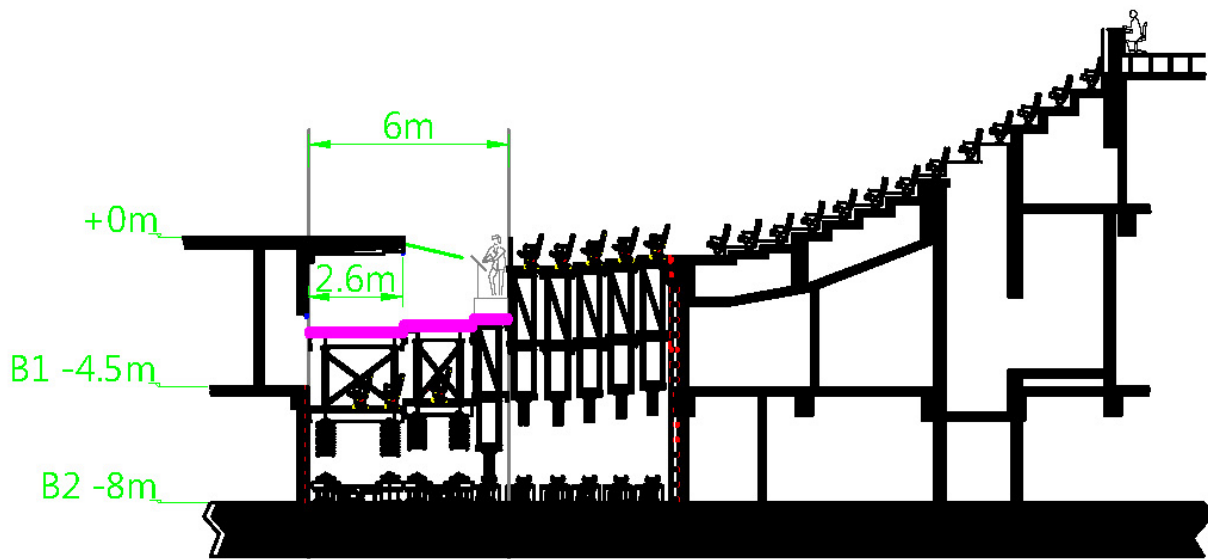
Orchestra Pit Elevation Platform Section
